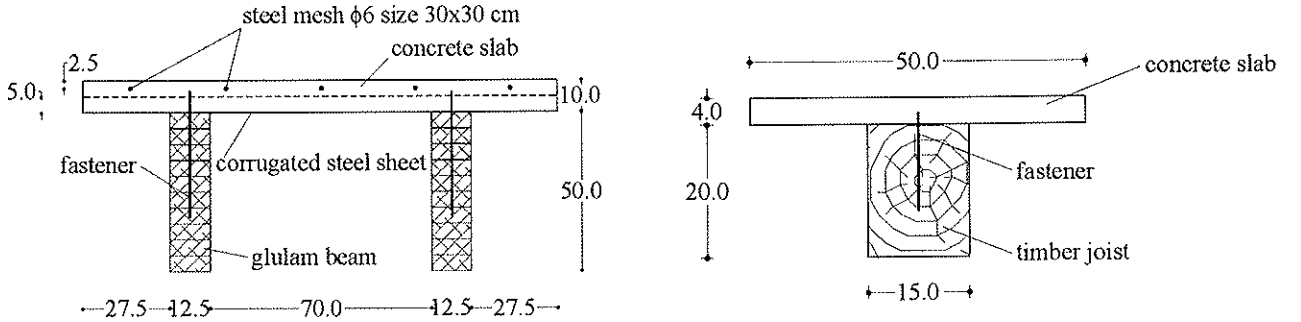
Cross section of the "GL", long span, and "S", short span, composite beams - Measures in cm
